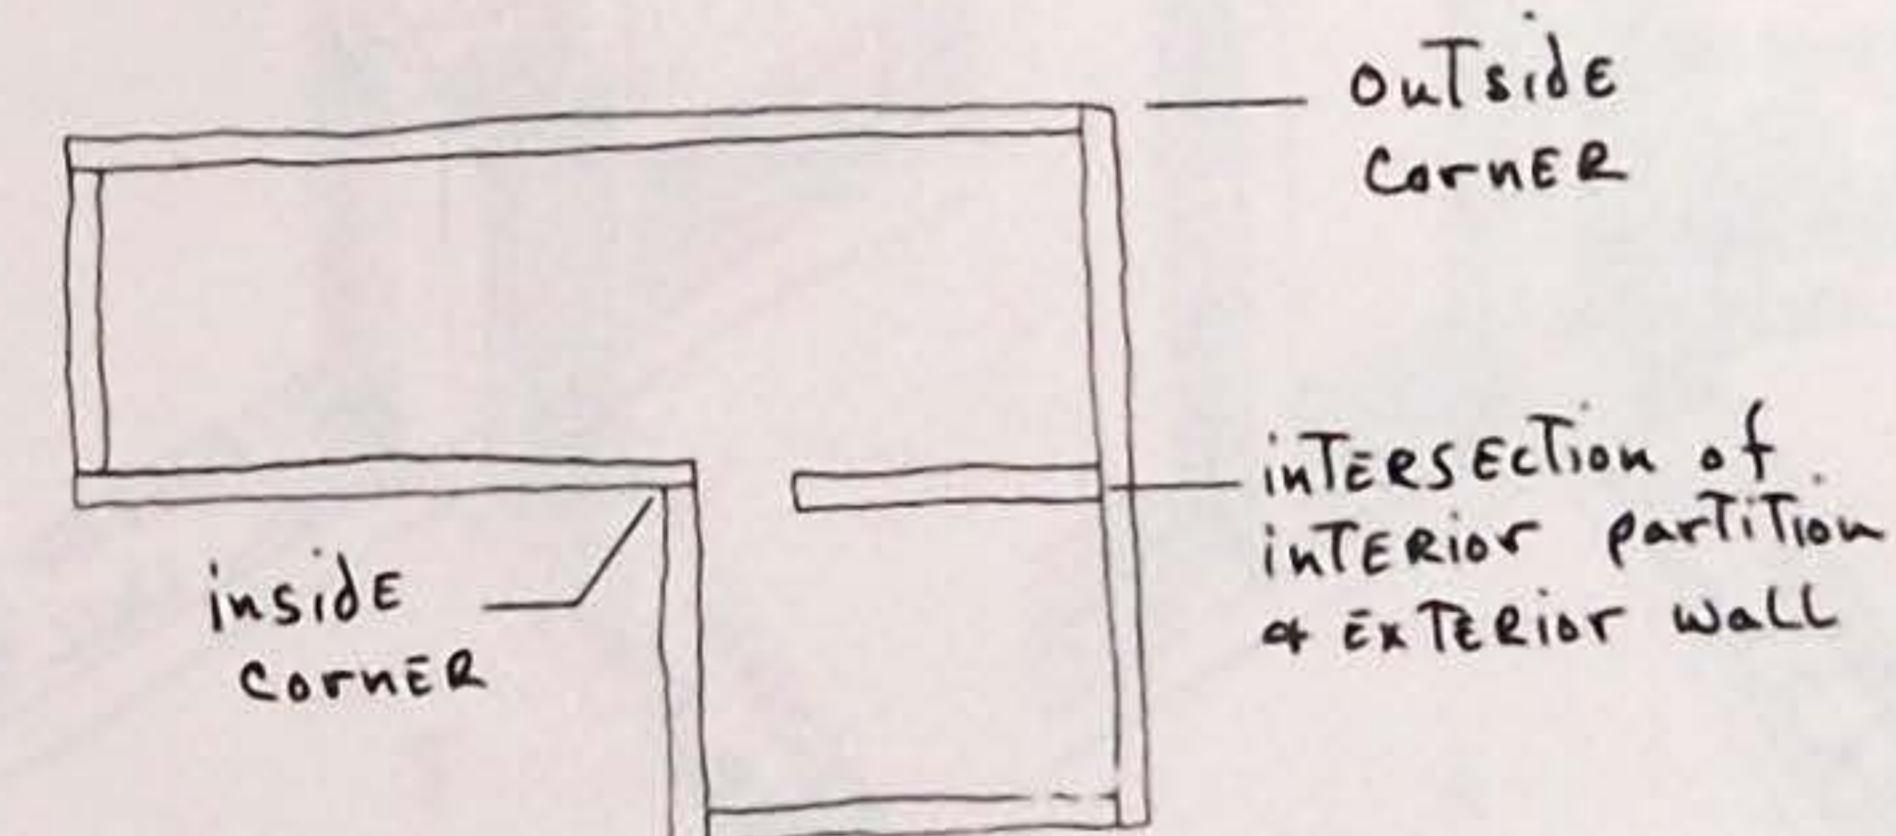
HOUSE with INSIDE & OUTSIDE CORNERS
